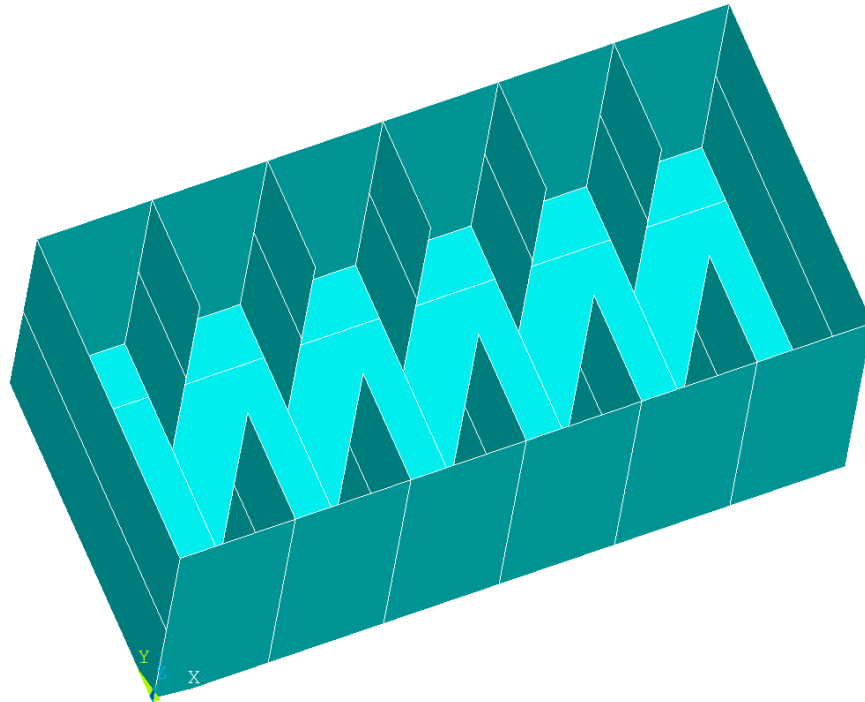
ANSYS Solid Model for the Foundation Perimeter Walls, Rib Walls, and Basemat
